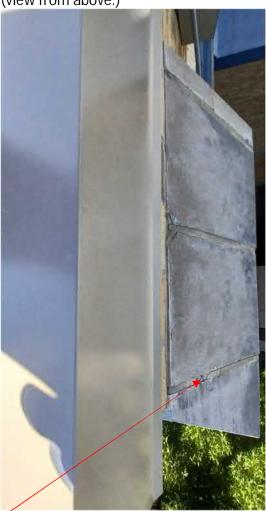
Top, stone cap of brick pier, some cracking of mortar joints, tuckpointing of large crack in joints will be needed. East side of pier, large crack at the top of the pier. Possible separation of bricks, anchor failure etc., more investigation required.
